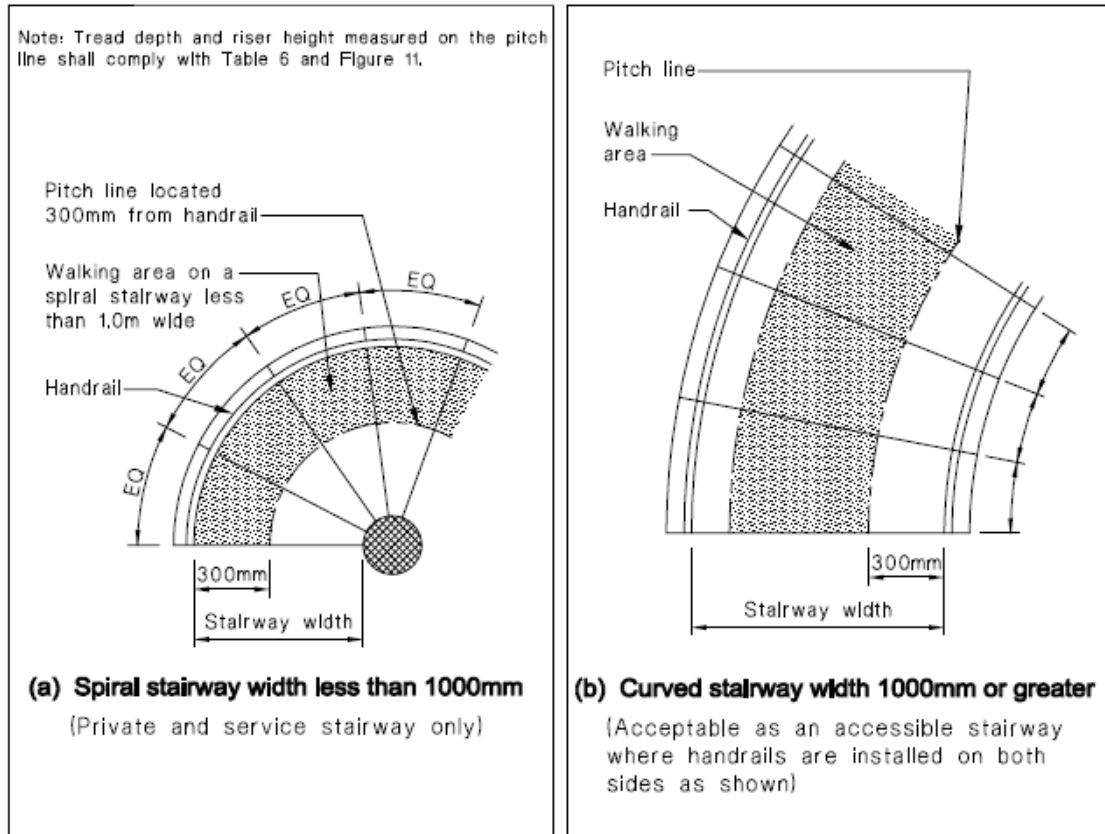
Design limits for narrow and wide spiral stairs in New Zealand. (Department of Building and Housing, 2011)
